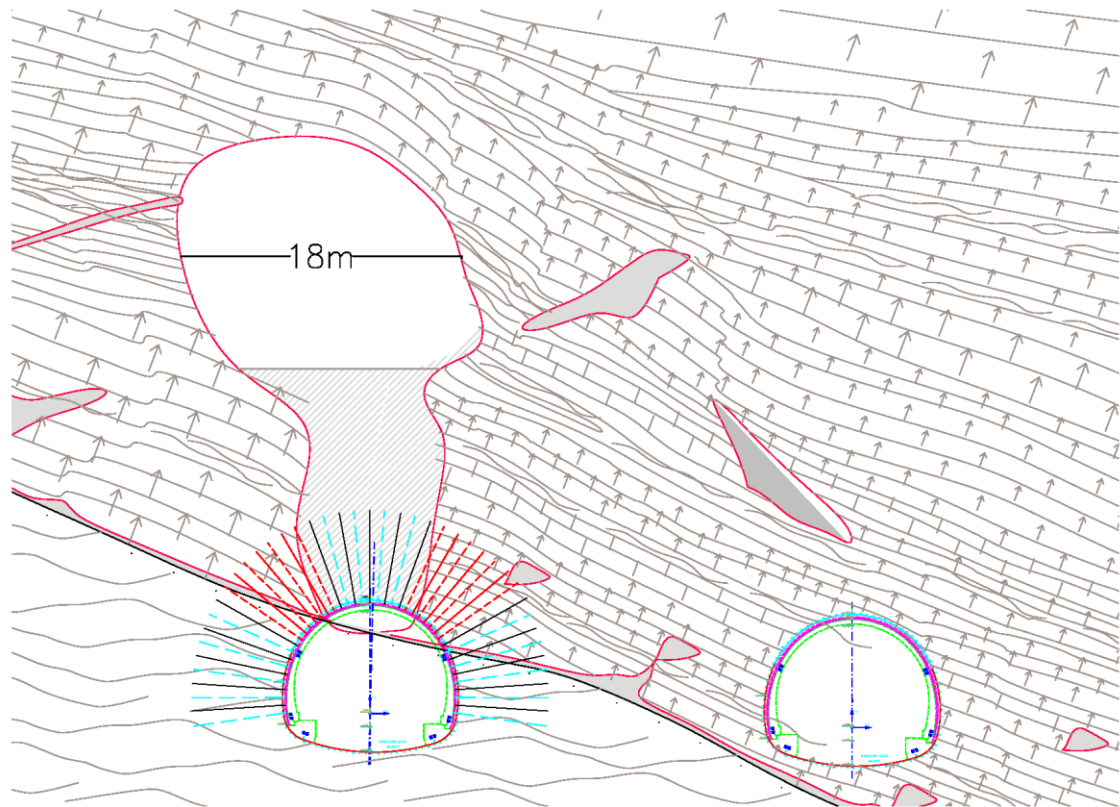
A schematic showing the layout of the tunnel tubes and the cavern encountered during the excavation of tunnel Ivan (location of the cavern is indicated in Fig. 3).
